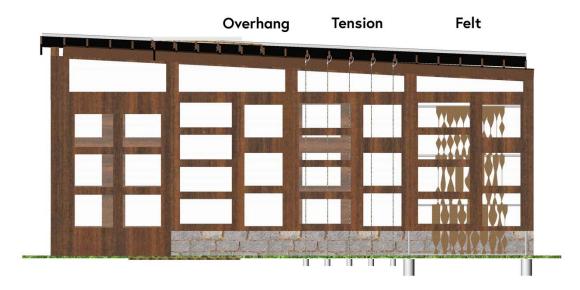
Rendered Drawing of South Elevation with Green Façade System Support Structure
